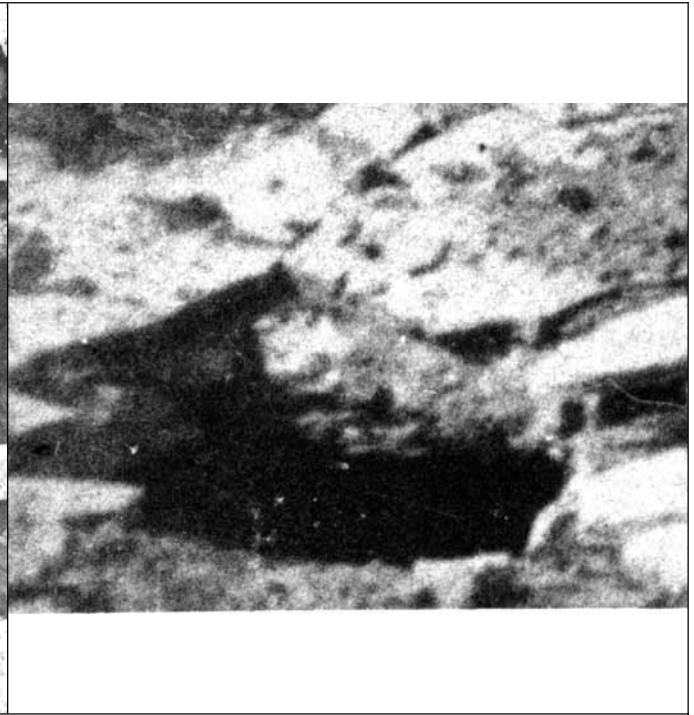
Concrete roof of morgue 1 of crematorium II in Birkenau. Opening 2 in June-July 1945. Section enlargement of photo 2.
